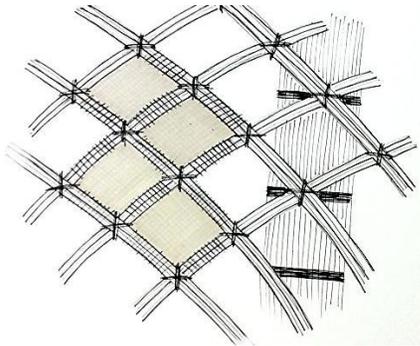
Hemp or jute bags fastened to the wall grid can be used instead of chicken wire mesh. The wall grid is fastened to the rods with metal wire
